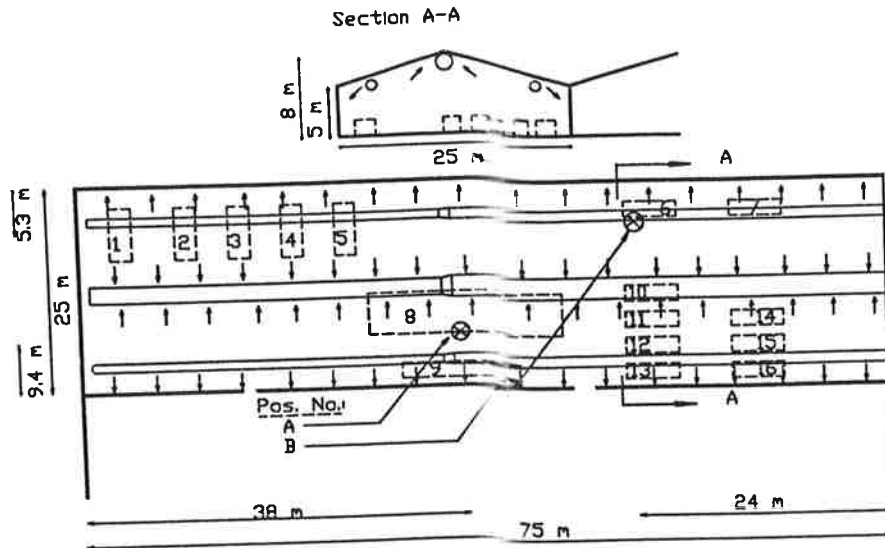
Layout and cross-section of the workshop designed for mixing ventilation (not to scale).
